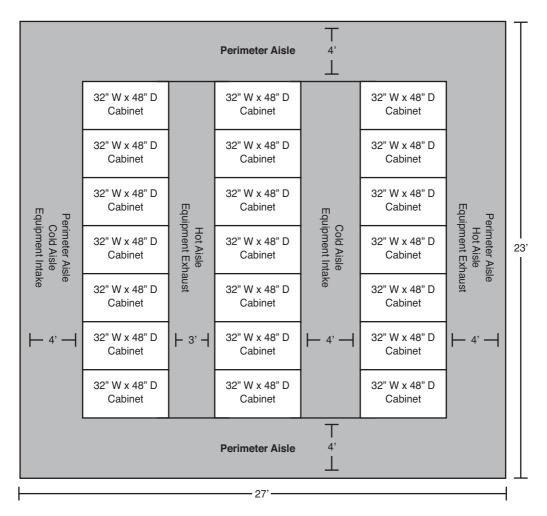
Equipment Cabinet Floor Plan Layout for a 600-Square-Foot Facility
